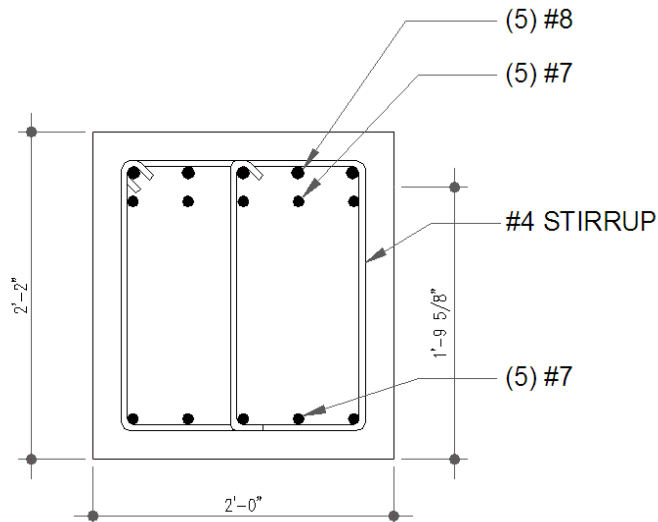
Detail of Typical Reinforced Concrete Beam at Column Line 1.8
